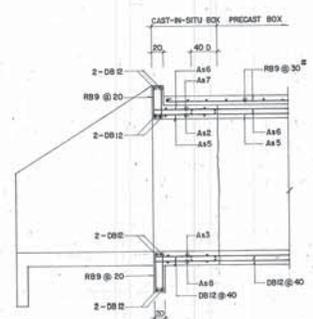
DETAILS FOR SKEW θ CAST-IN-SITU BOX
